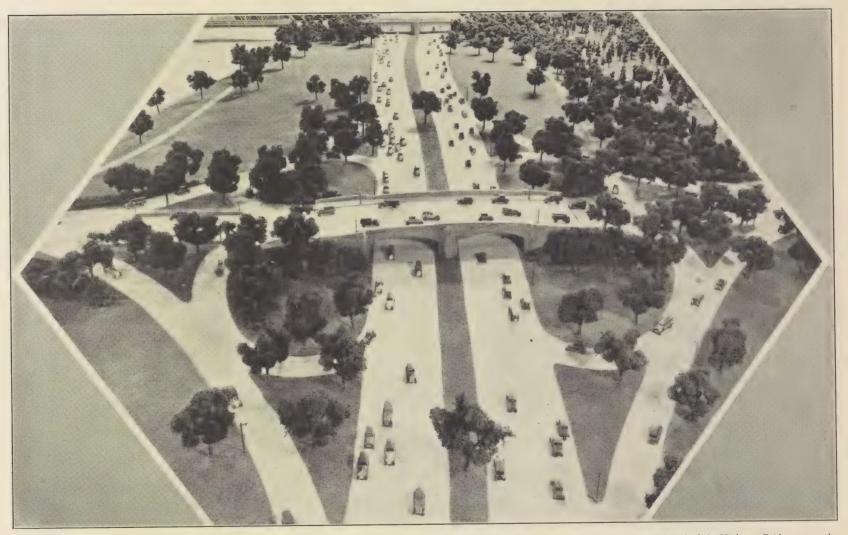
Photograph of a model, constructed to scale, of the highway grade separation and connecting ramps planned for construction at the south end of the Highway Bridge across the Potomac River
